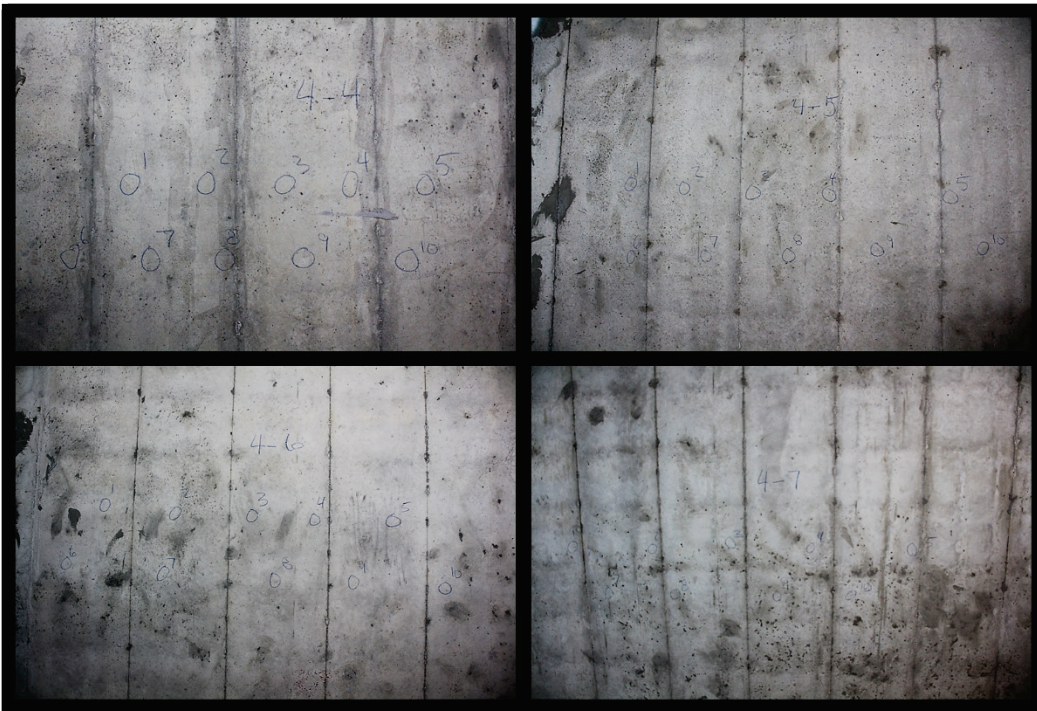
Rebound hammer test locations in Tower 4—Floors 8 through 11.
